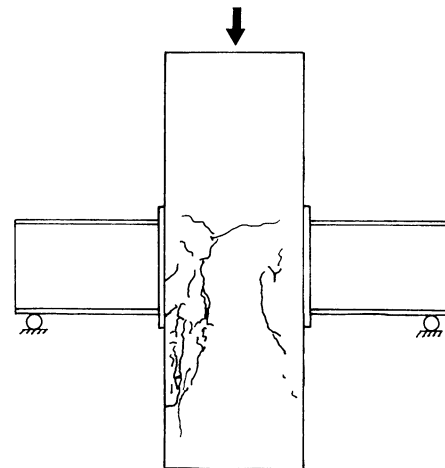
Sketch of the concrete cracking of specimen 3 of Group I at failure
